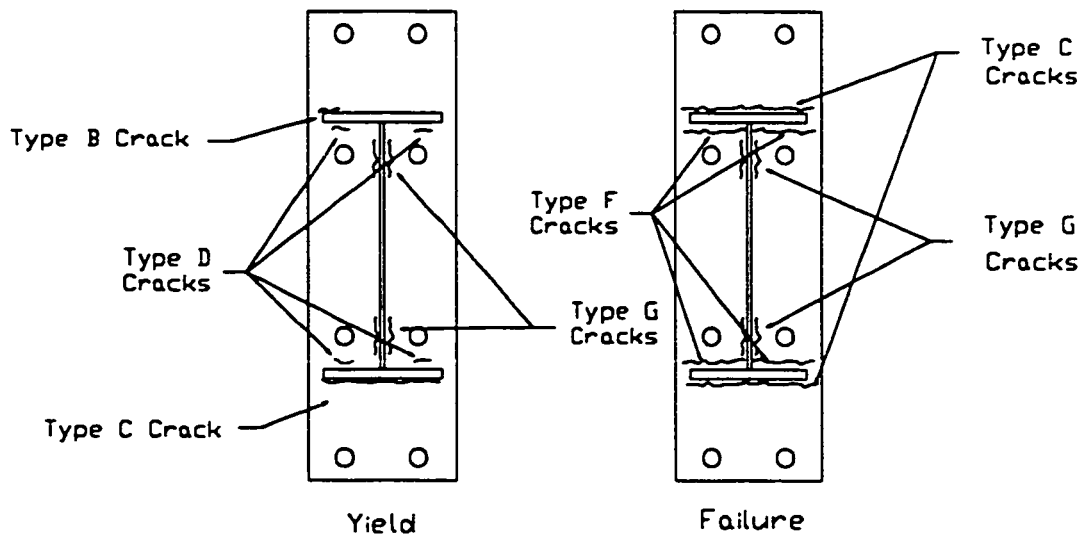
Crack Locations at Yield and Failure for Connection M-3
